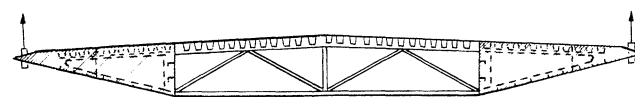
A proposed cross-section, New Burrard Inlet Crossing, Vancouver, B. C., Canada
